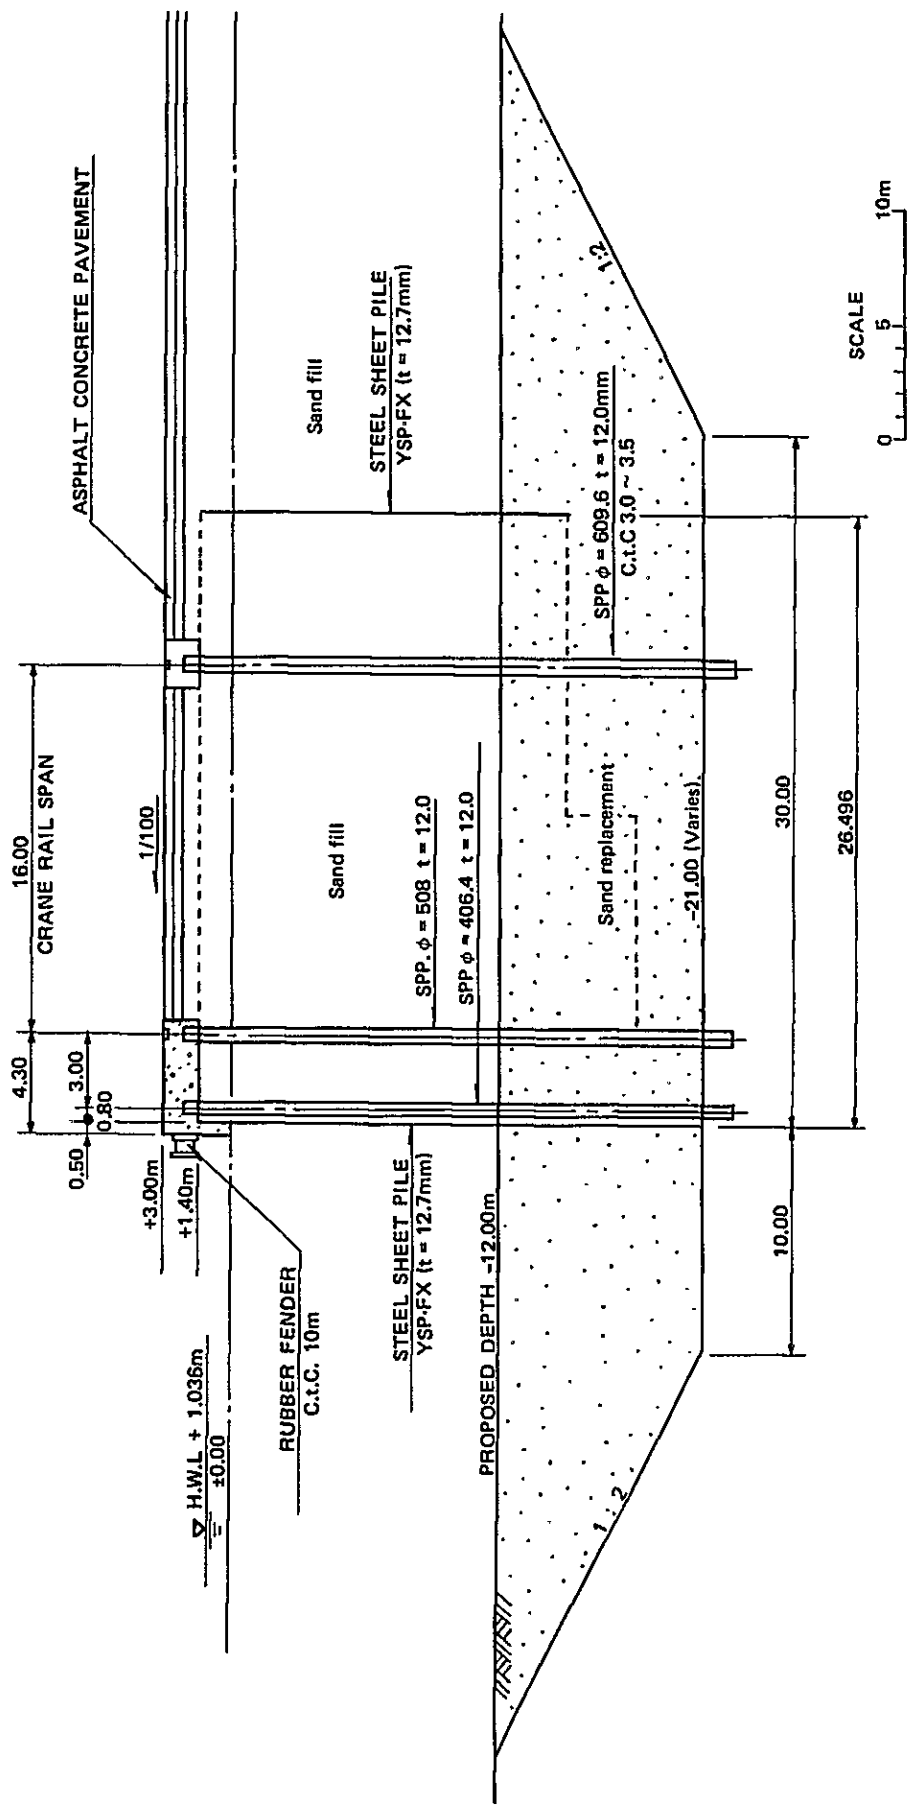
Container Berth Quay Wall (Steel Sheet Pile Cellular Cofferdom Type)
